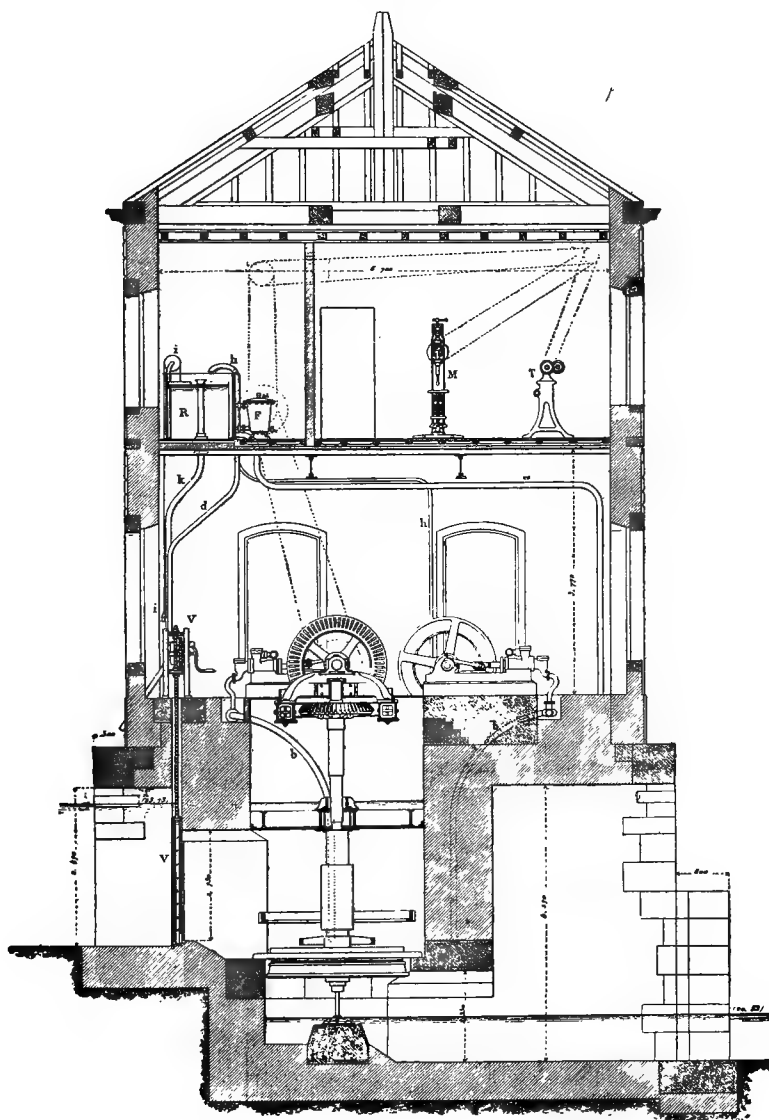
Machinery house, transverse section along C, D, E, F (Fig. 13).
